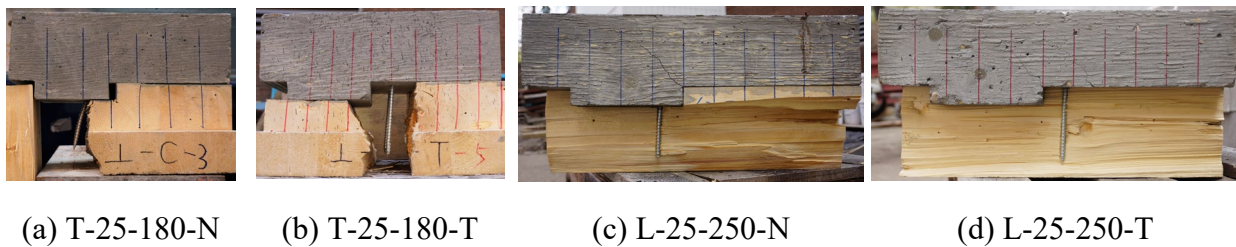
Deformation of screws after the notched connection specimens were tested
